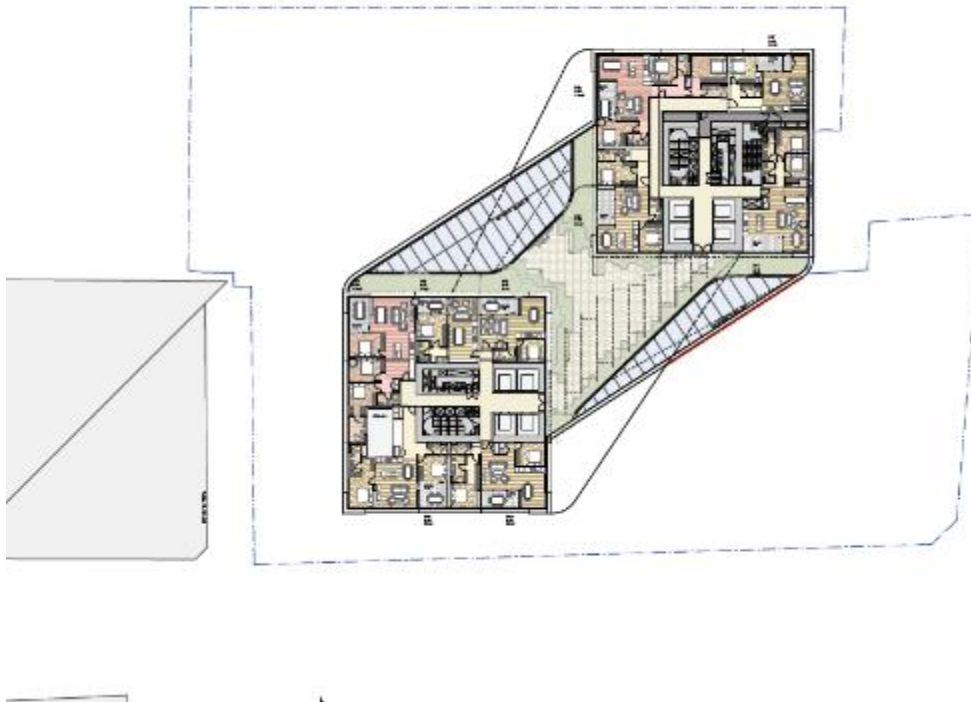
| Typical tower residential and hotel floor plan (Source: FJMT)
